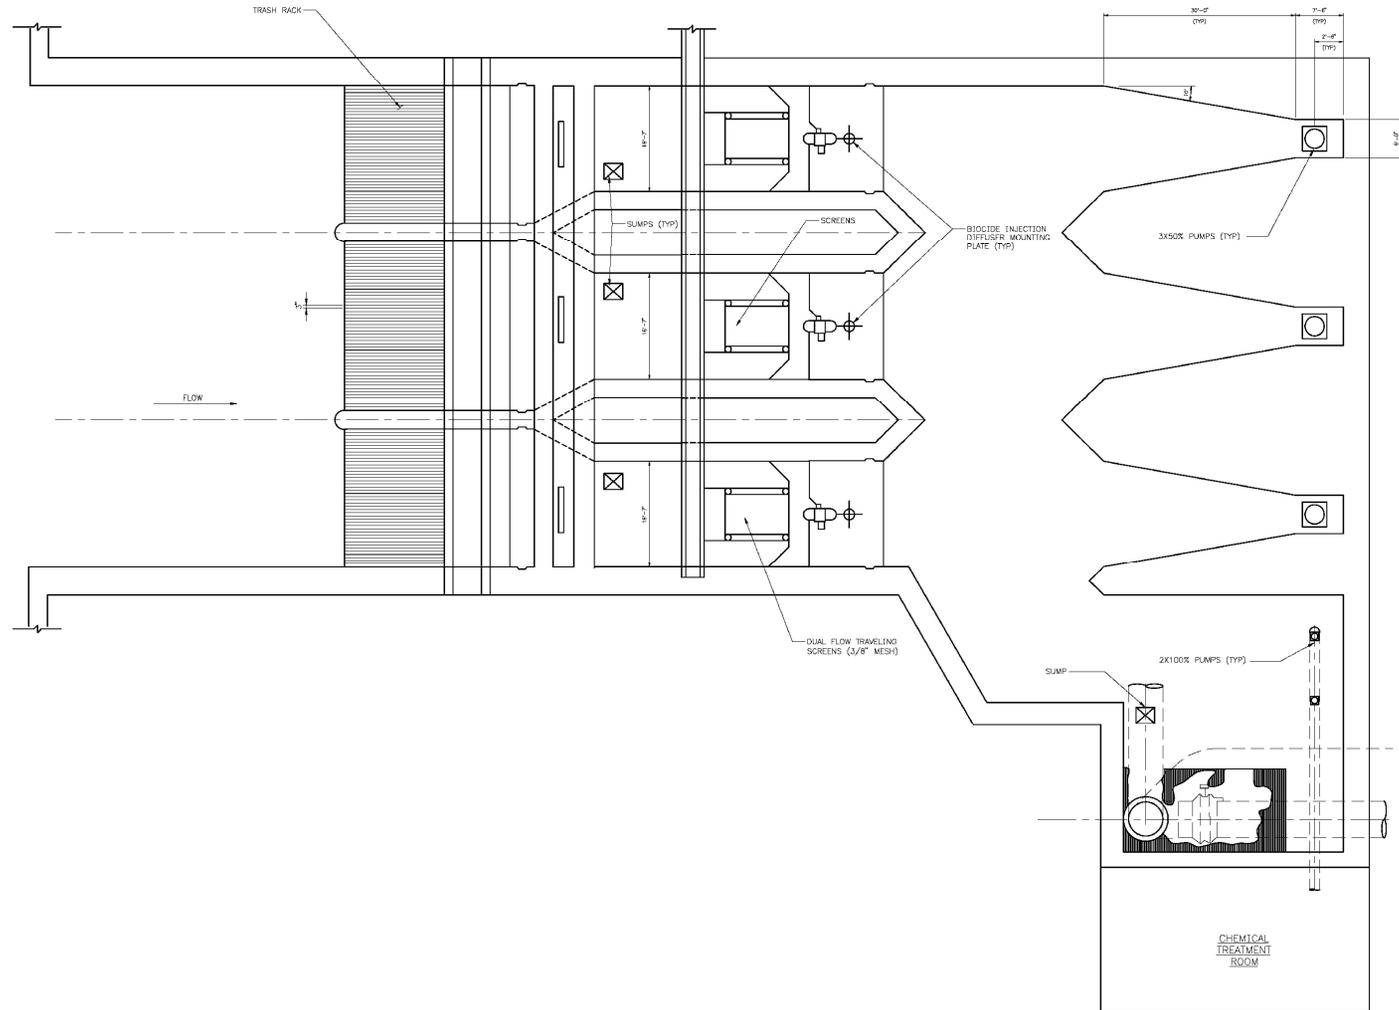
Fermi 3 Station Water Intake Structure (Elevation View)
